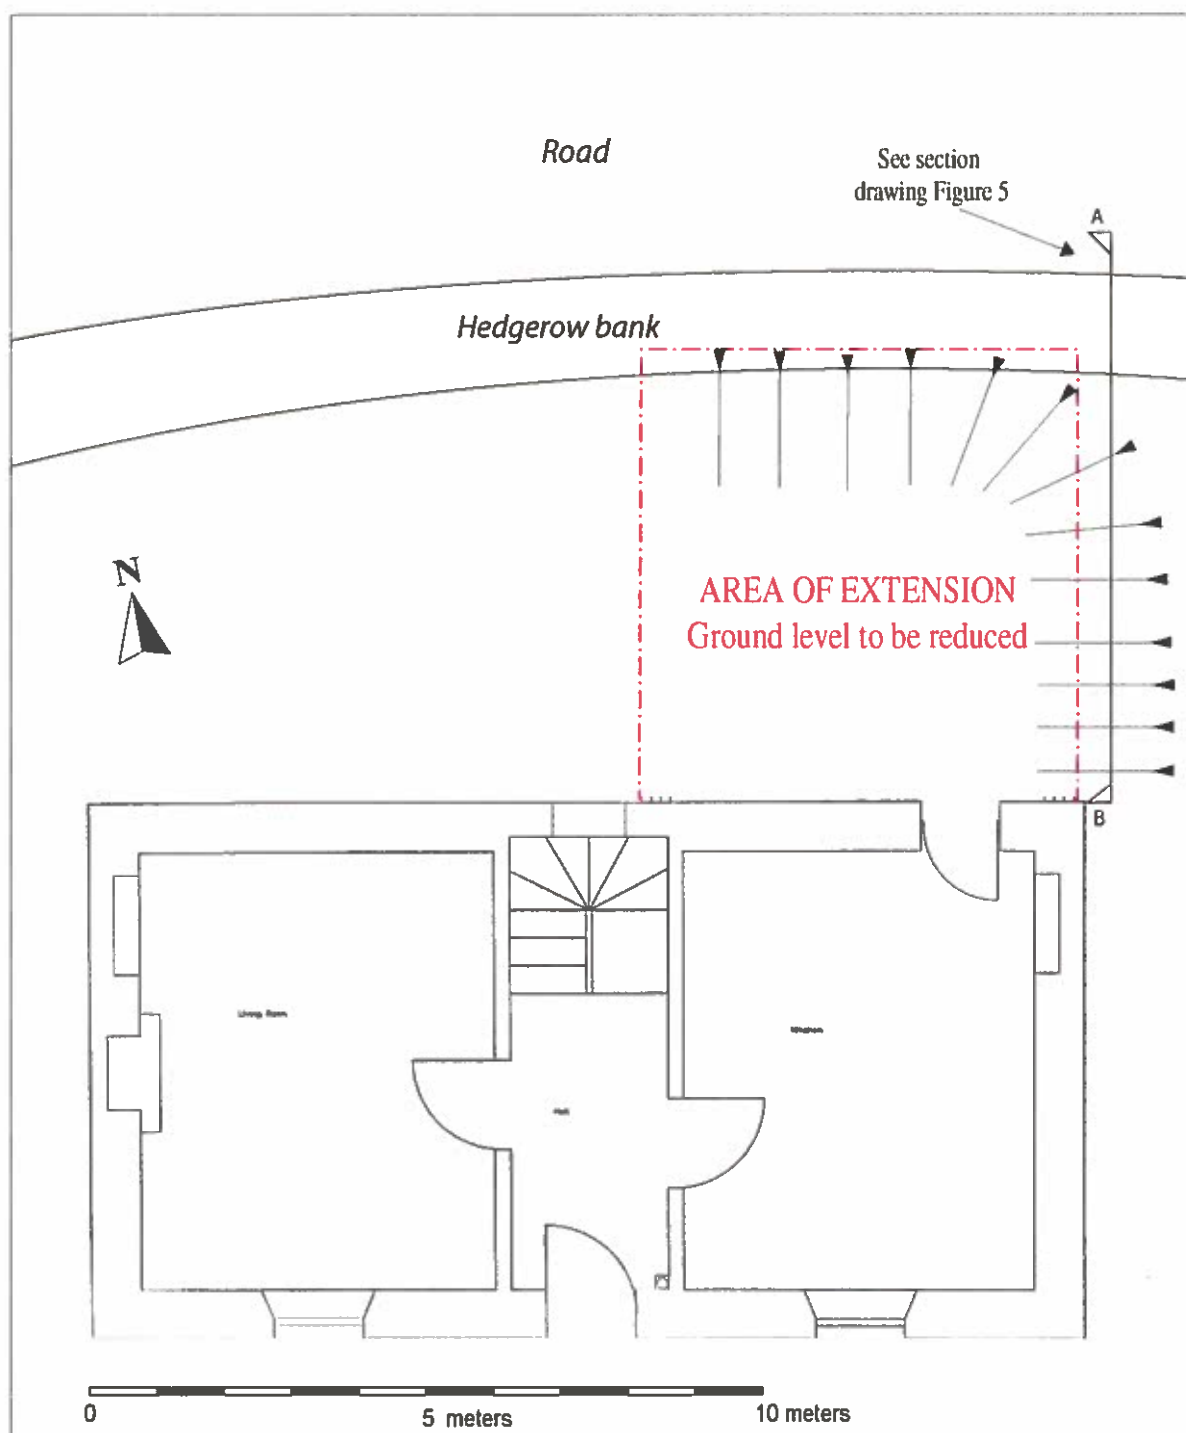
Ground plan of Picton Park House showing proposed area of ground works at rear of main house for extension.
